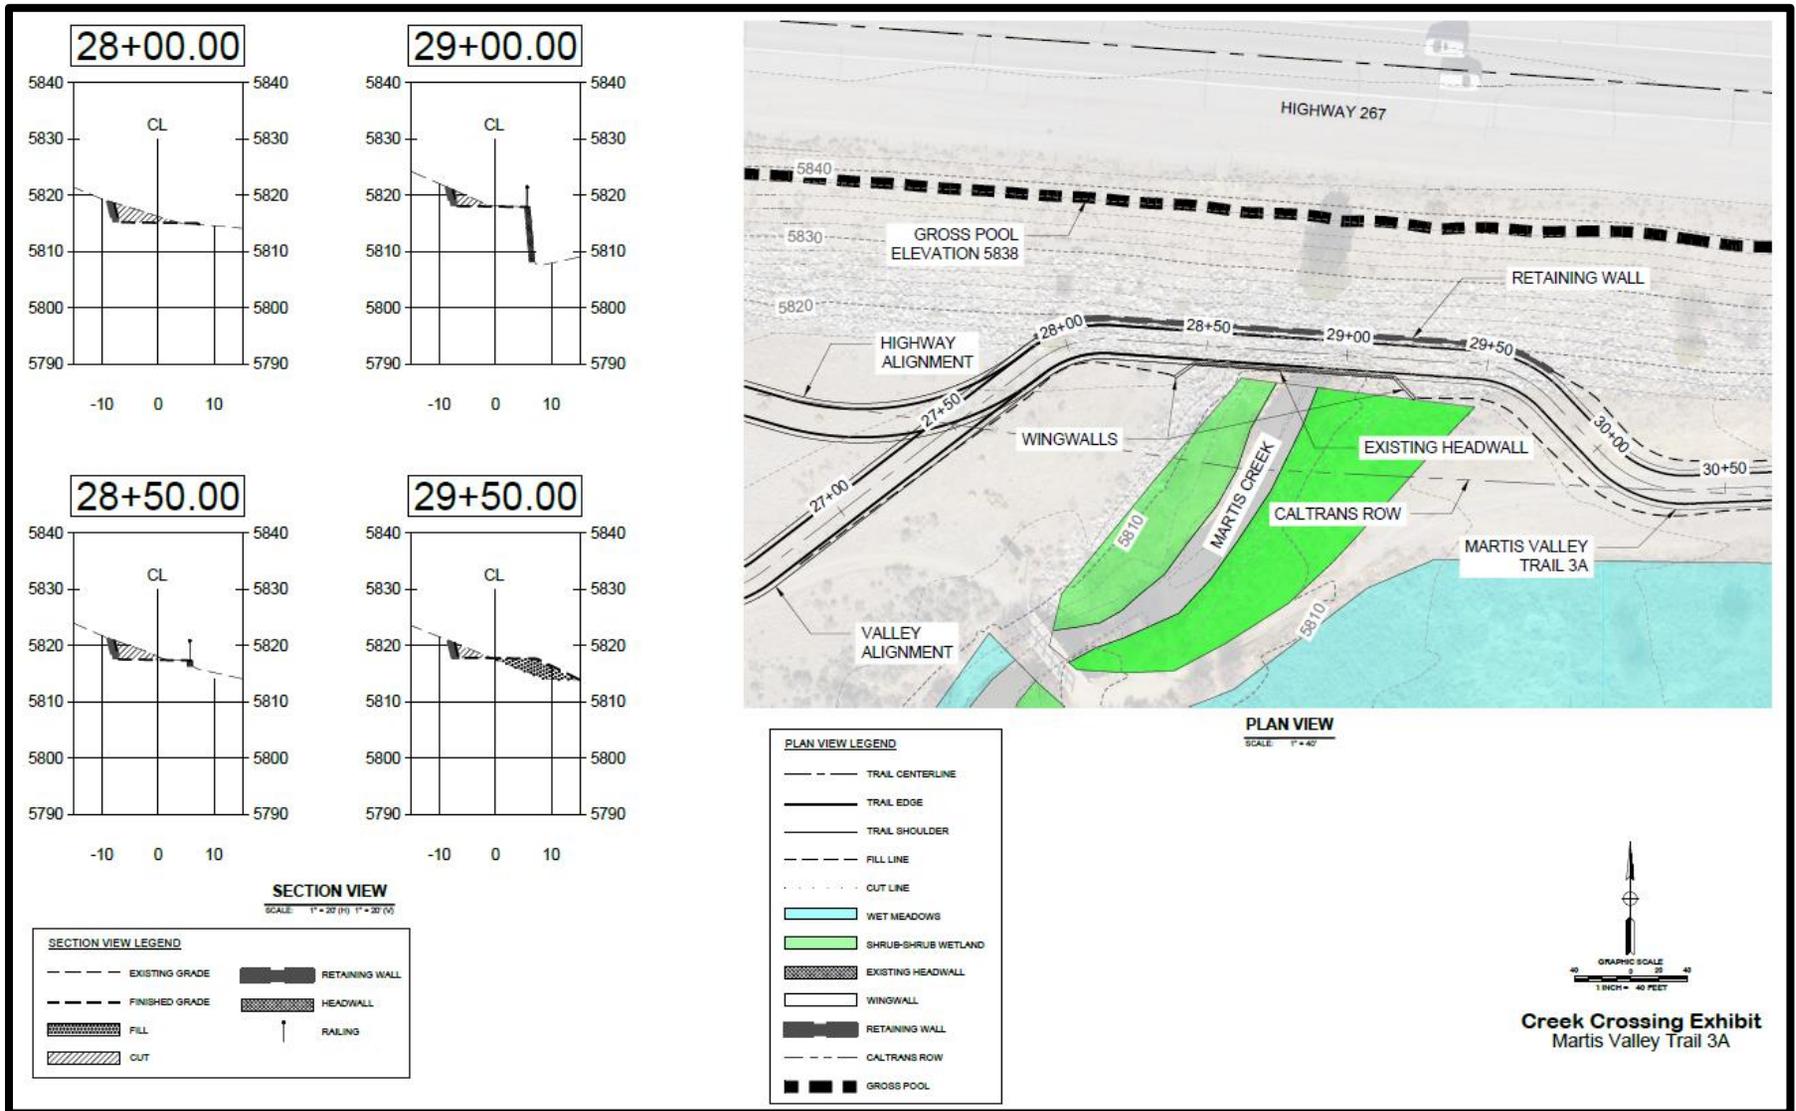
Proposed Creek Crossing Using the Existing Caltrans Culvert Structure.
